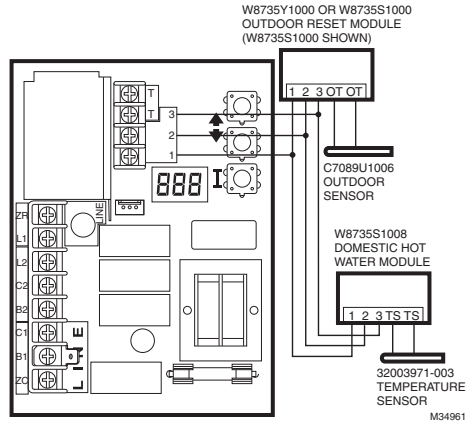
Wiring the Outdoor Reset Module and the Domestic Hot Water Module.
